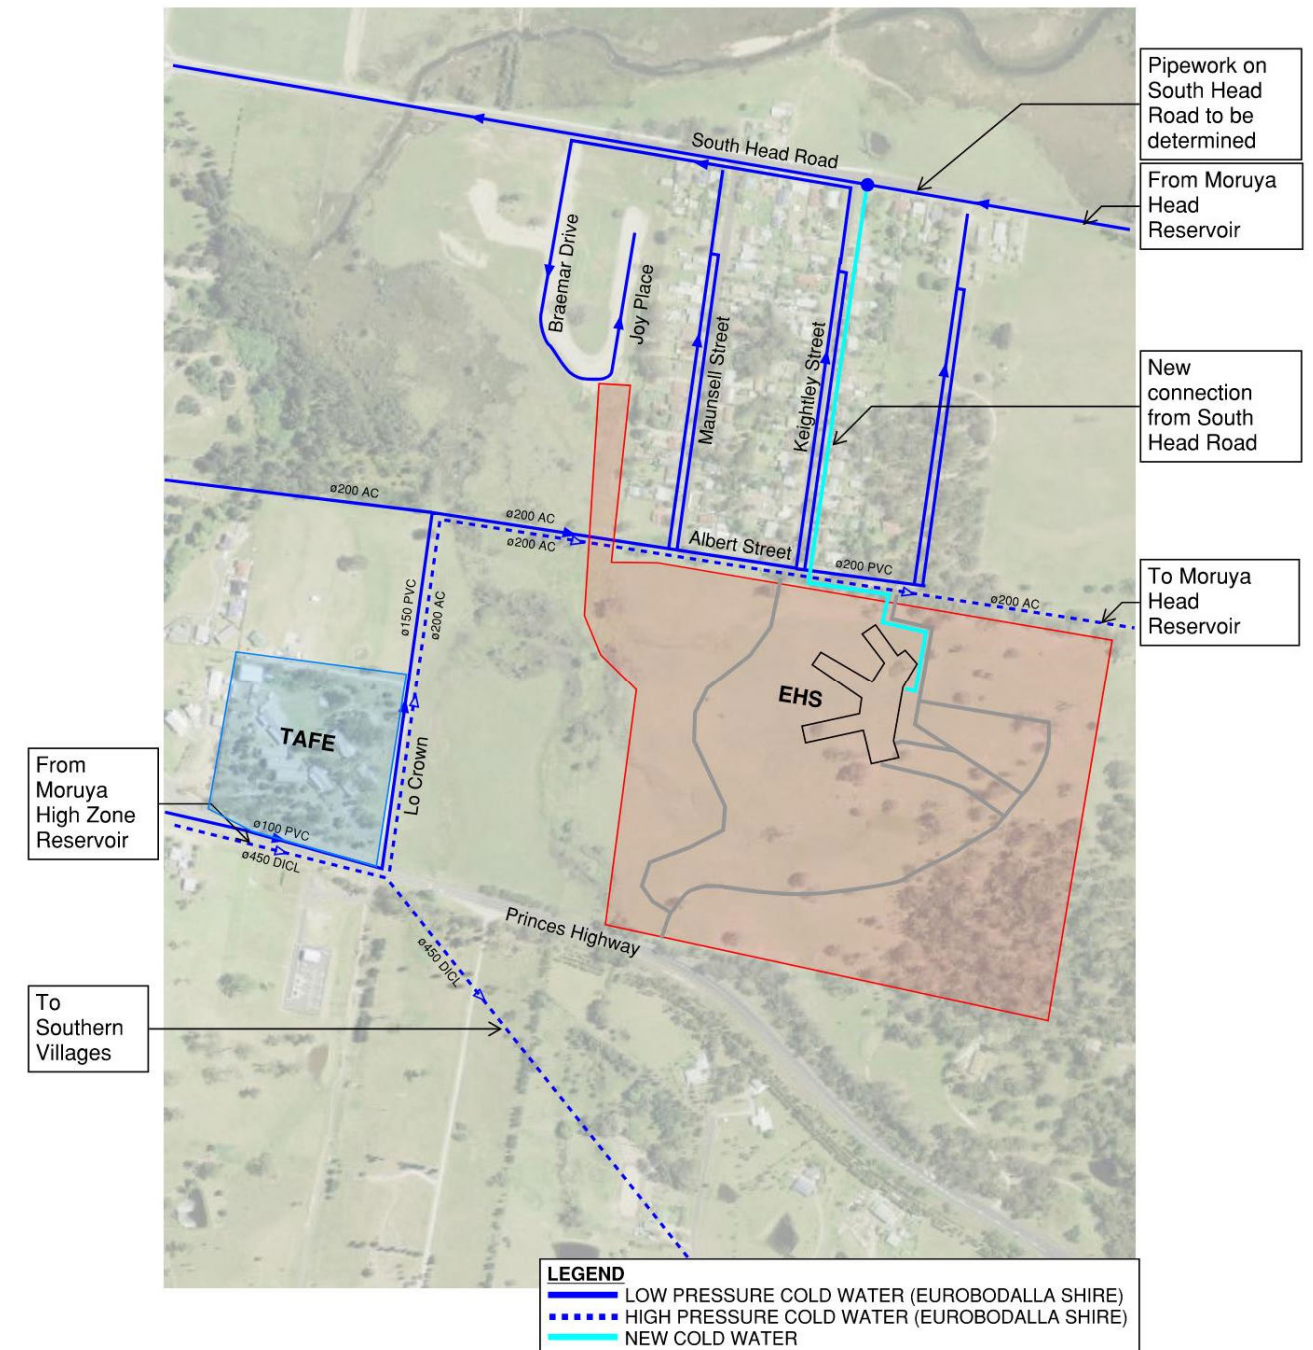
Option 1 - New cold-water connection from South Head Road – low pressure green. New Connections shown in green.
